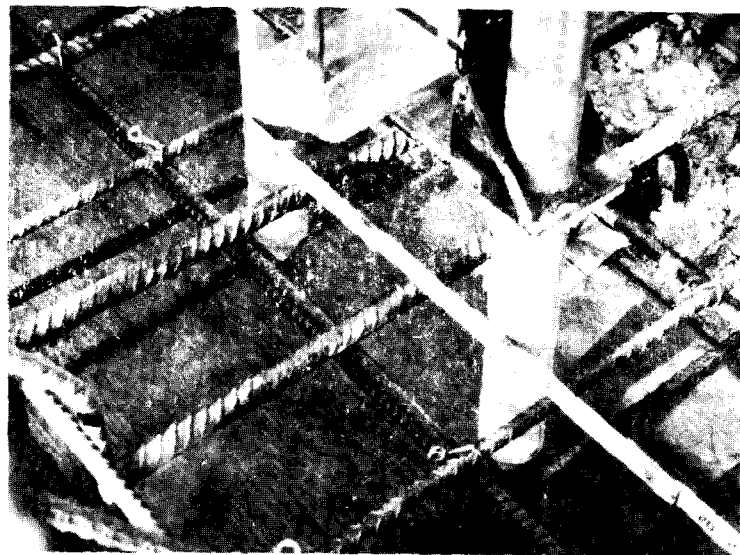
A typical steel rebar layout encountered on a bridge deck tested.
